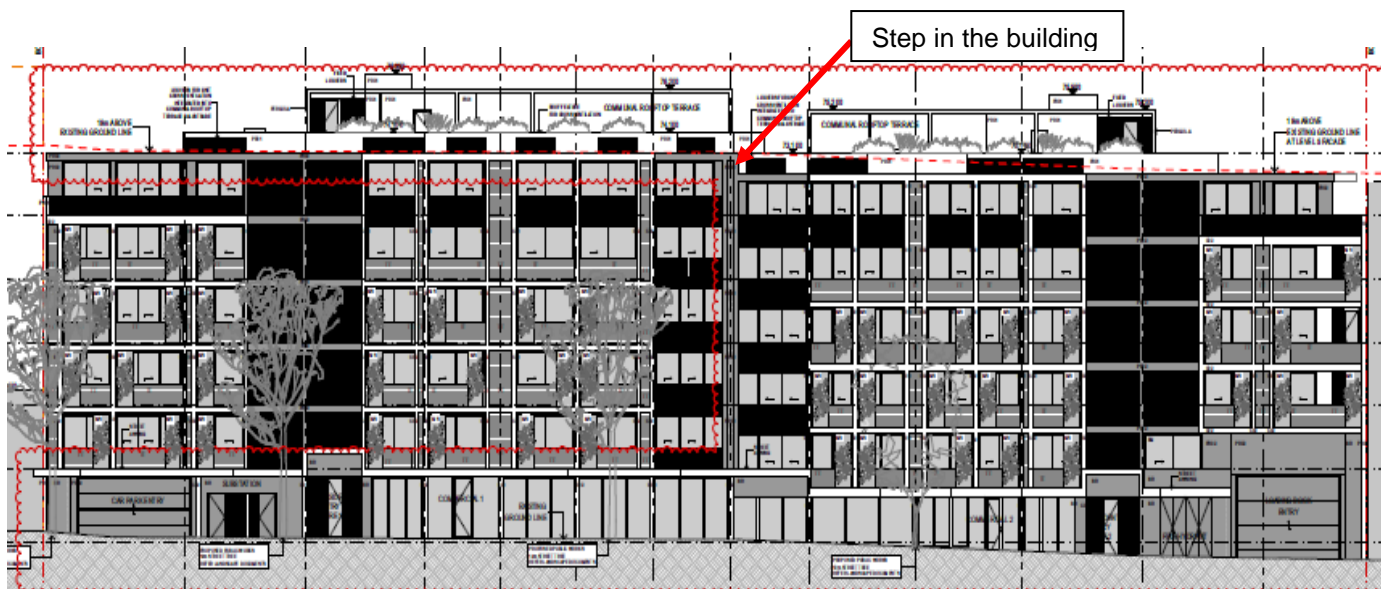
Victoria Road elevation. The amended plans have introduced a step in the building. This not only ensures compliance with the height control but it also reduces the scale and massing of the building.
